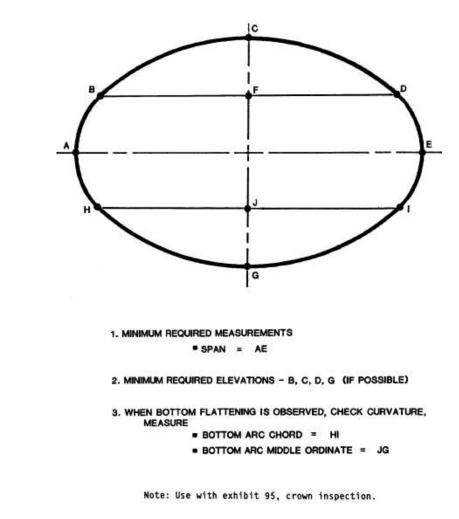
(Exhibit 103) Shape Inspection Long-Span Horizontal Ellipse
